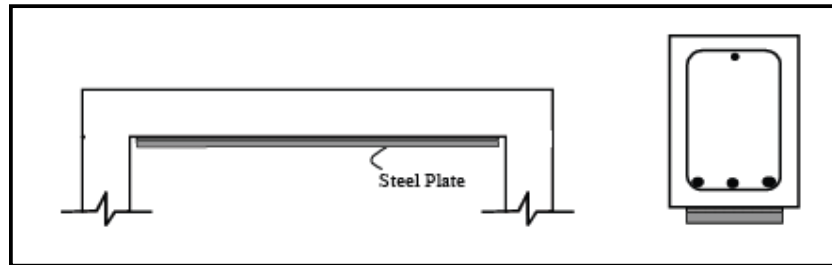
Rehabilitation of beams with steel plates (Al-Salloum, 2002)
